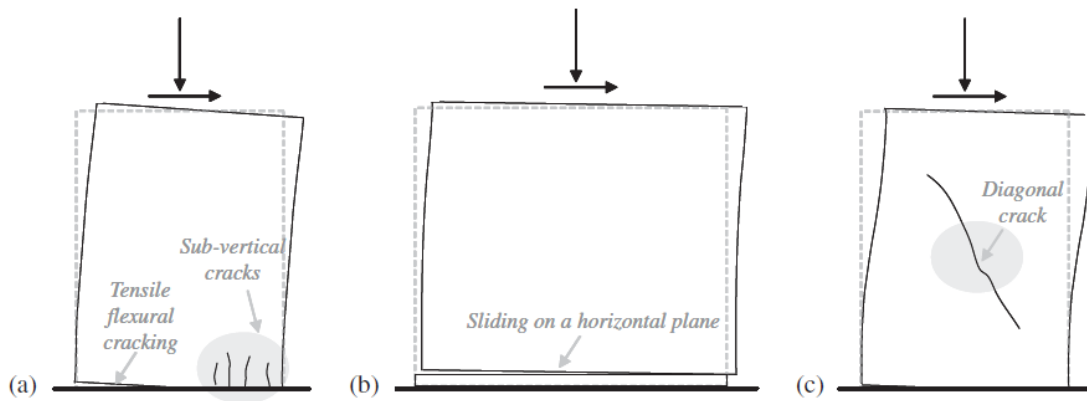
Typical failure modes on the masonry piers subjected to in-plane loadings (a) flexural failure, (b) sliding shear failure and (c) diagonal shear cracking (Calderini, Cattari, and Lagomarsino 2009)
